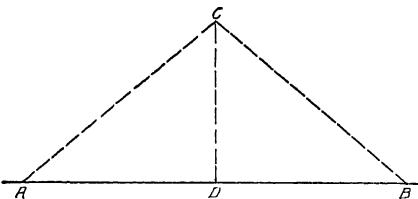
Diagram Showing Method of Determining Line of Road between Successive Towns
